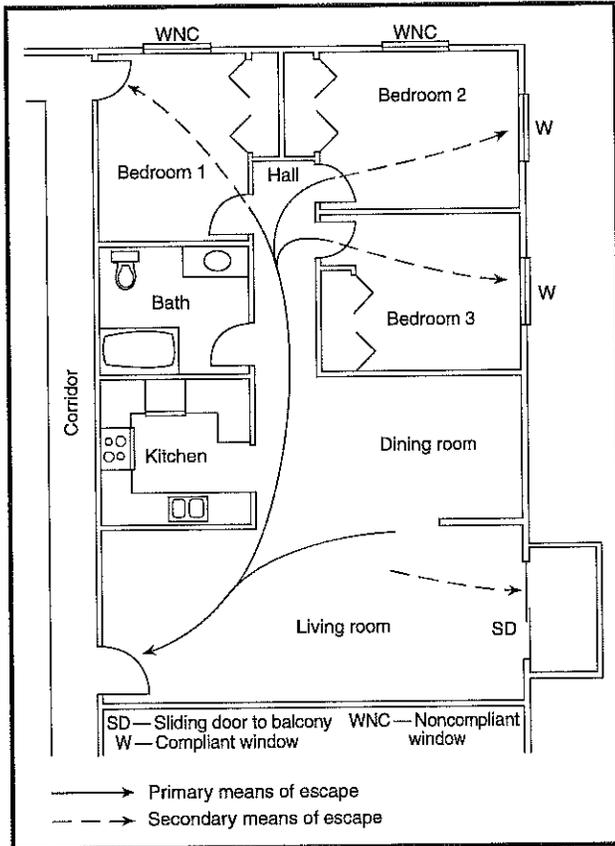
Secondary means of escape arrangement complying with 24.2.2.
